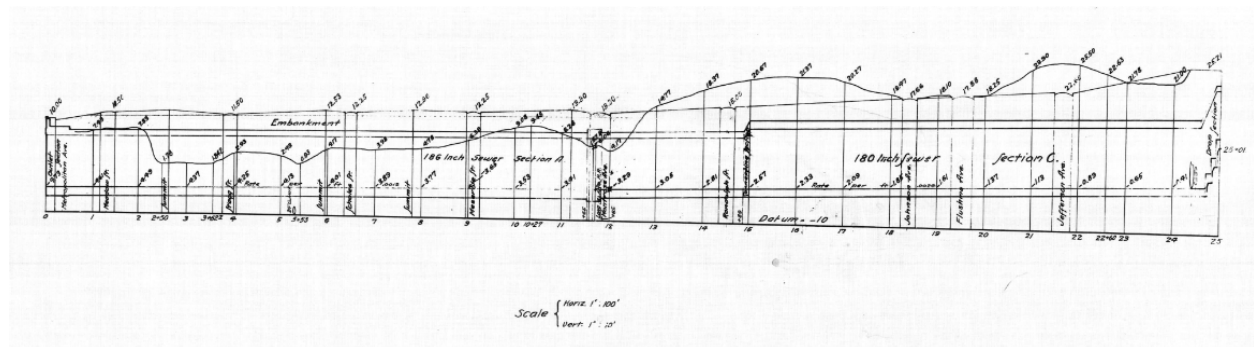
Longitudinal Profile of NC-083 Outfall Barrel.
